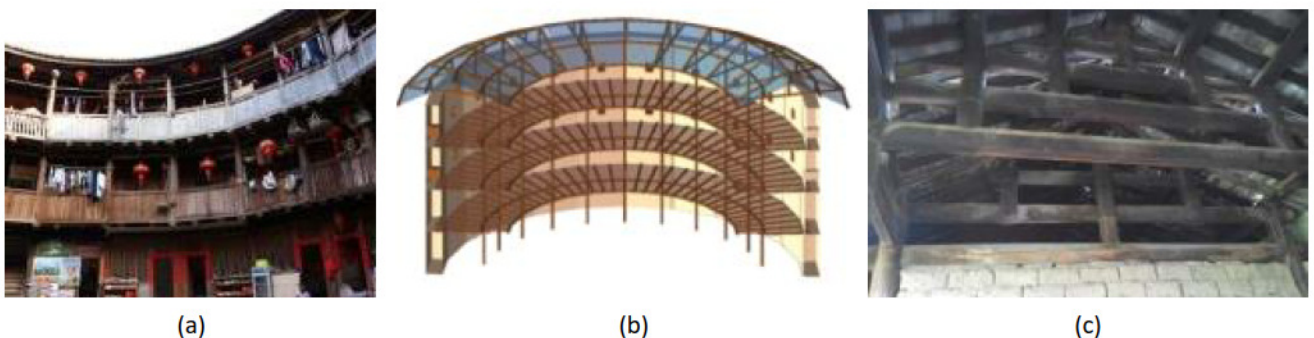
Tulou inner wood rings: vertical pillars (a), model geometry (b), and wood truss (c)
